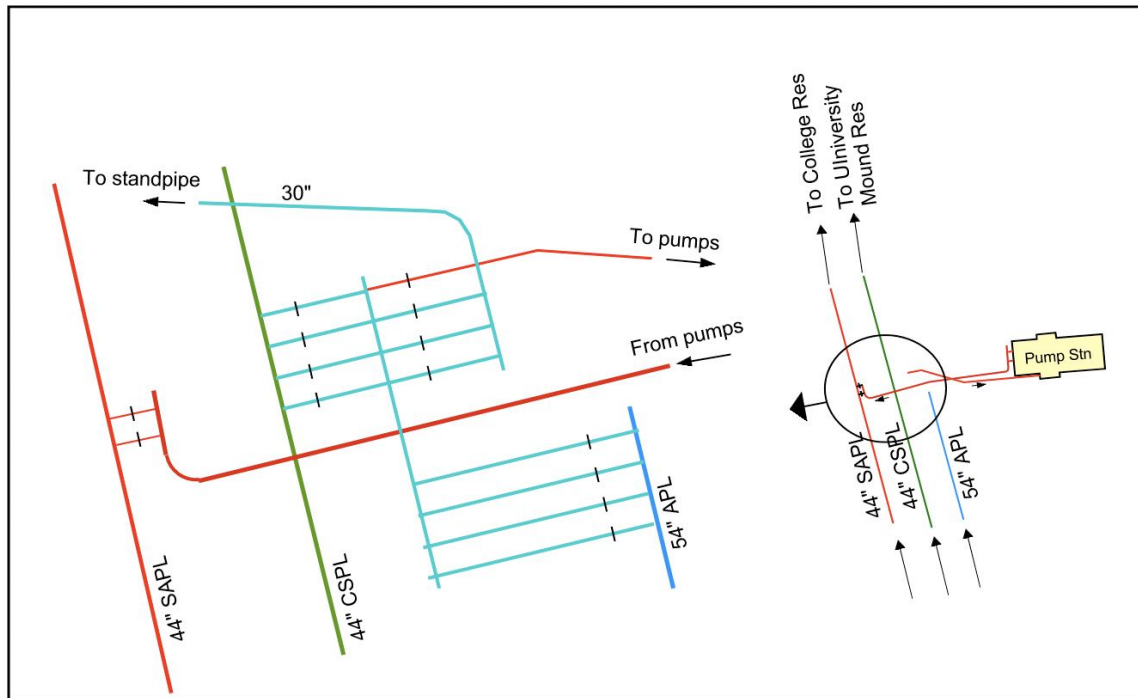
Millbrae Pump Station Arrangement (not to scale)
